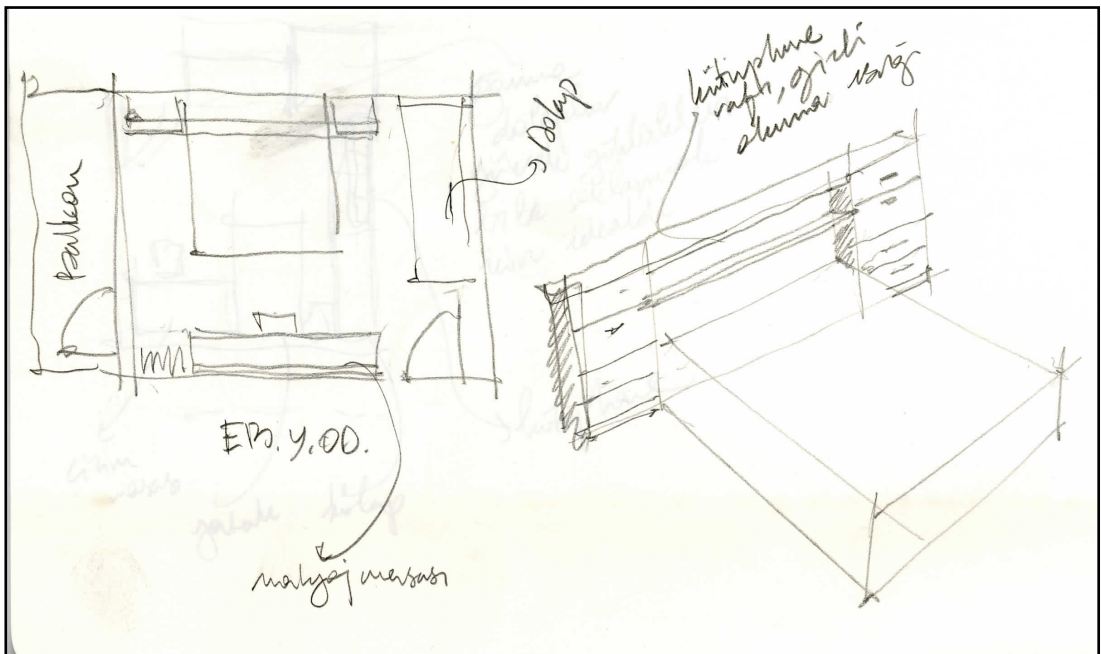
Öncüoğlu's sketch of his parents' bedroom plan and its furniture
